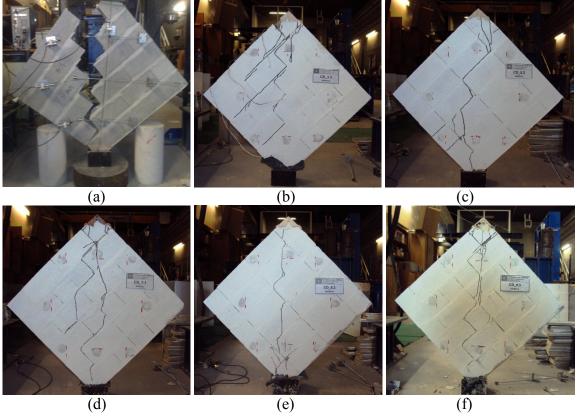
Crack patterns for distinct reinforcement configurations; (a) unreinforced masonry; (b) specimen HRM3; (c) specimen VRM2; (d) specimen HVRM1 (e) specimen HVRM2; (f) specimen HVRM2
